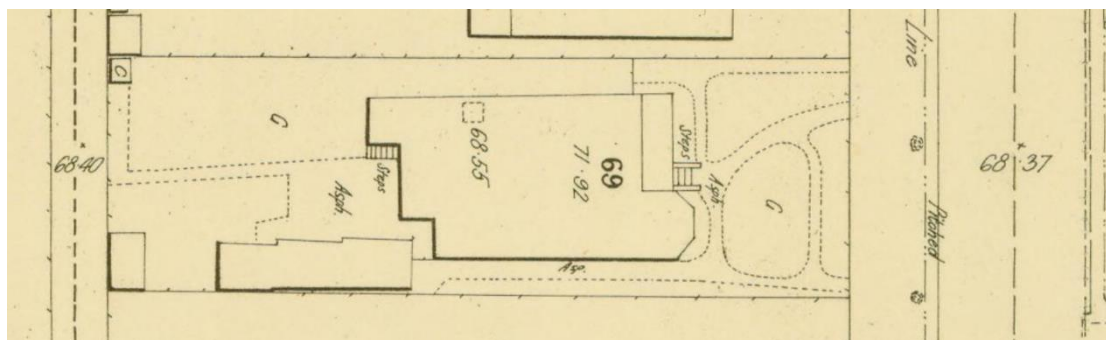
Detail from MMBW Detail Plan No 831, dated 1904, showing the house and grounds at 35 St Leonards Road, Ascot Vale (source: State Library Victoria)
